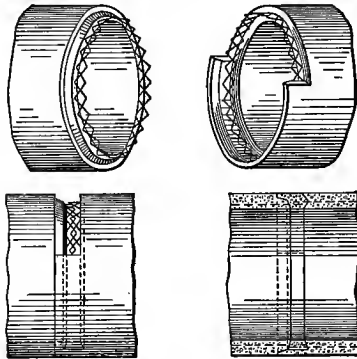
JOINT OF A REINFORCED CONCRETE PIPE.
